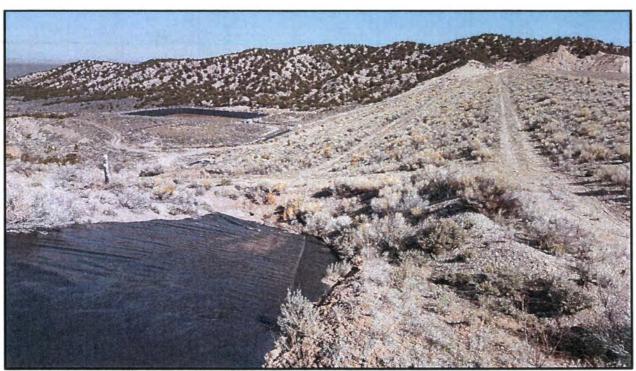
South end of dam at left abutment, looking northwest over the left downstream groin and downstream face.
